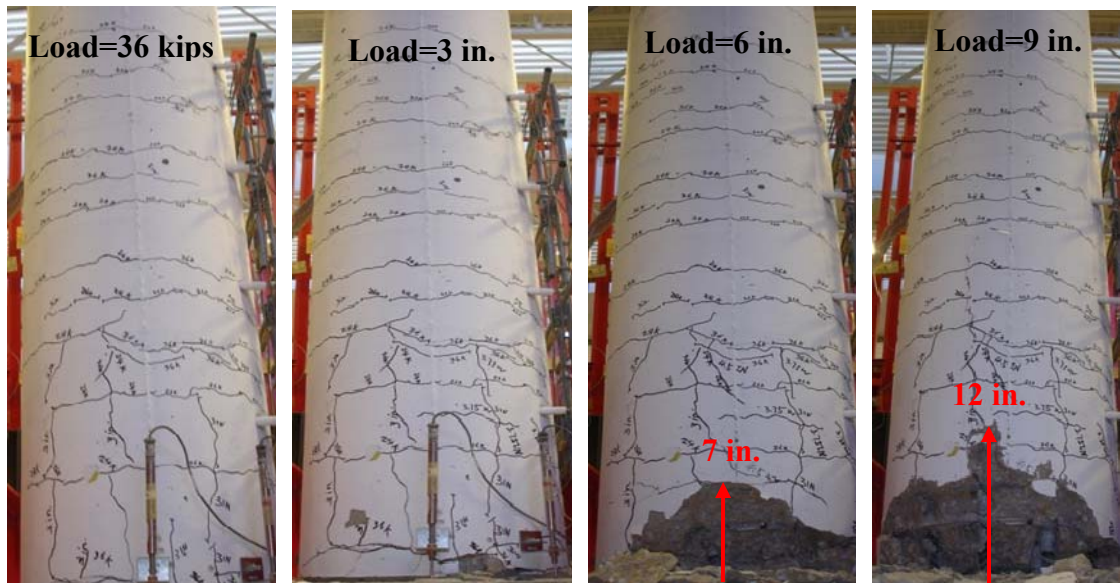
Concrete cover spalling and concrete core degradation of Column #1
